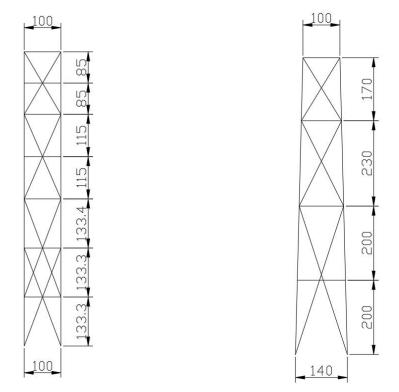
Right Side Face Dimensions Figure 4-6 Left Side Face Dimensions
